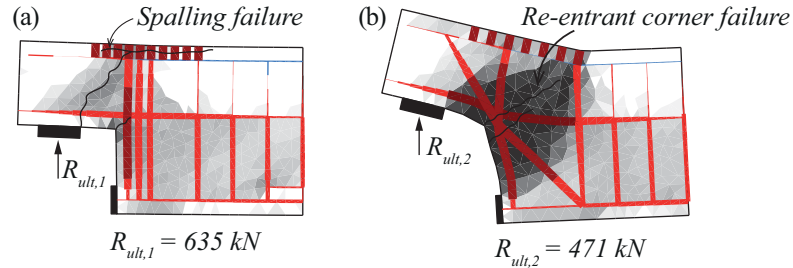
Failure mechanism of dapped-end beams: spalling failure – DEB 1.6 (a) re-entrant corner failure – DEB 2.1 (b) tested by Mata-Falcon [40]
